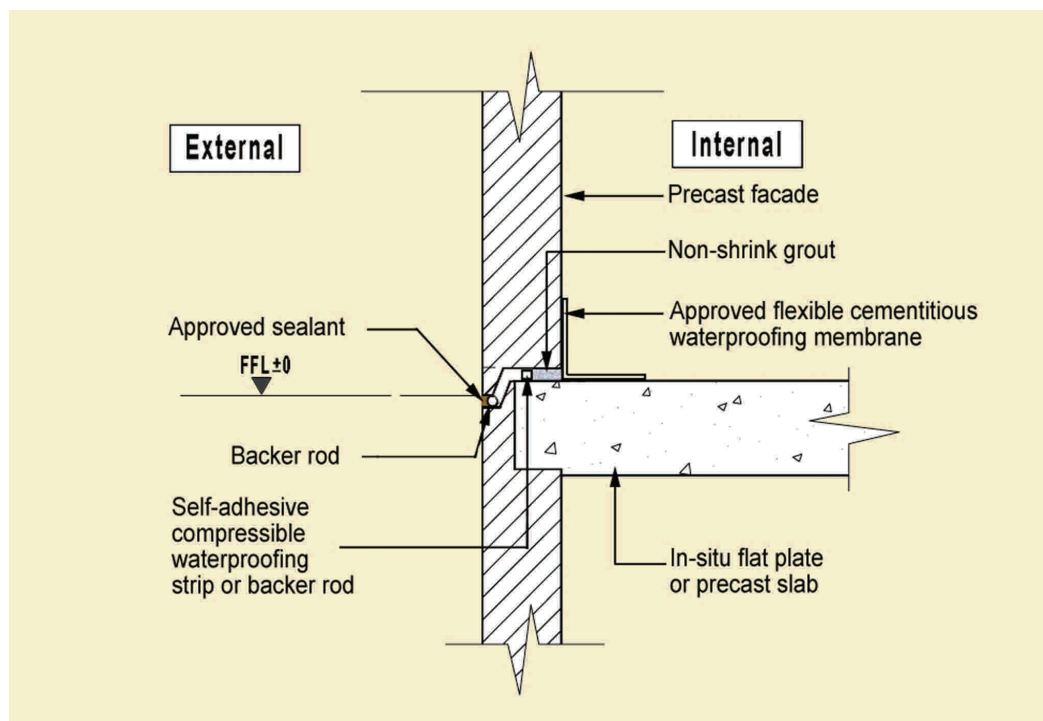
Horizontal joints between non-load bearing precast façade and floor elements
